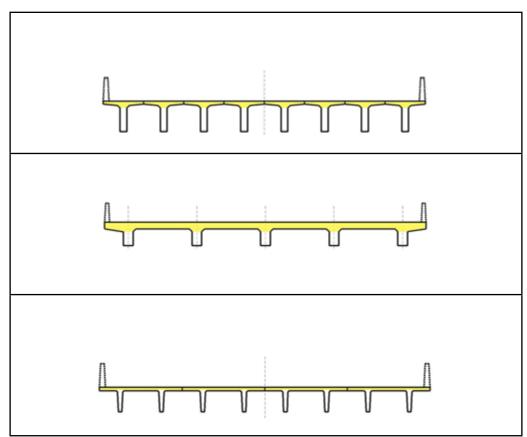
Reinforced Concrete Top Flange (Highlighted)
